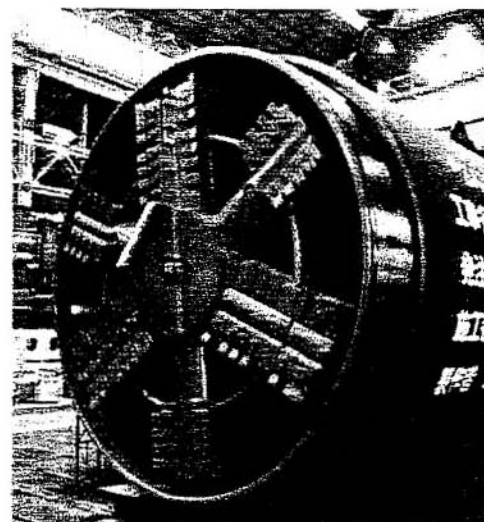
$\phi 3470$ mm shield machine for MSD method
